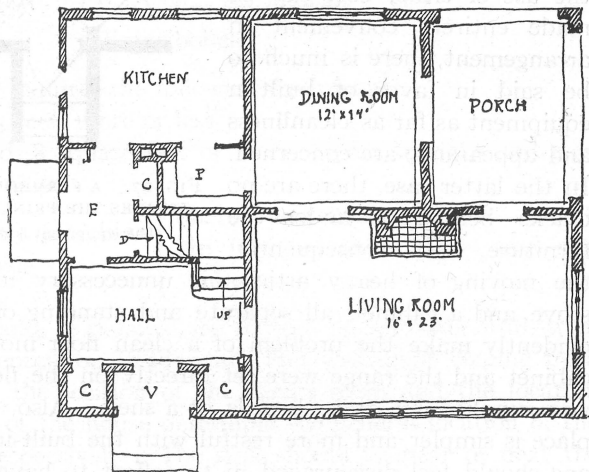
FLOOR PLAN OF THE HOUSE FROM WHICH THE KITCHEN IN FIGURE 28 IS STUDIED
